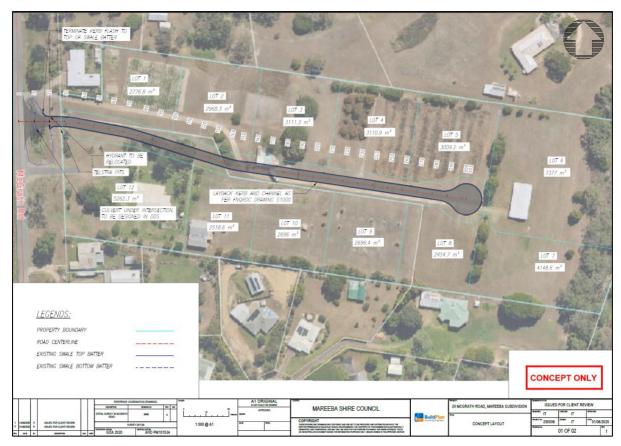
Road Layout (BuildPlan Consulting Engineers)
